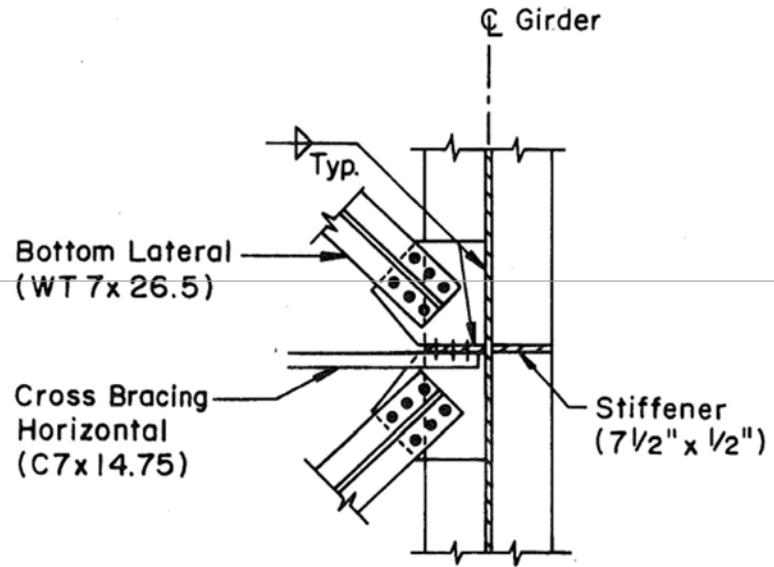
Connection of bottom lateral to girder flange (Daniels et al., 1987)
